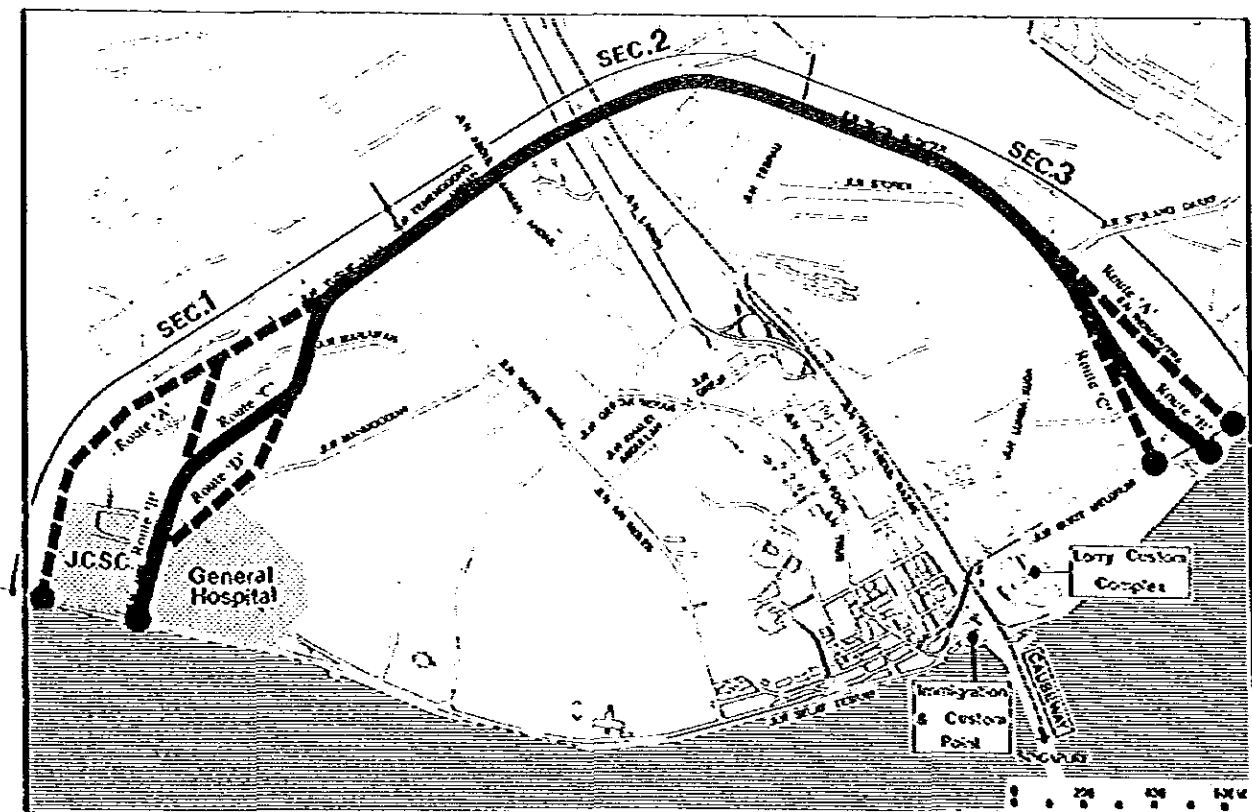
ALTERNATIVE ROUTES OF INNER RING ROAD
